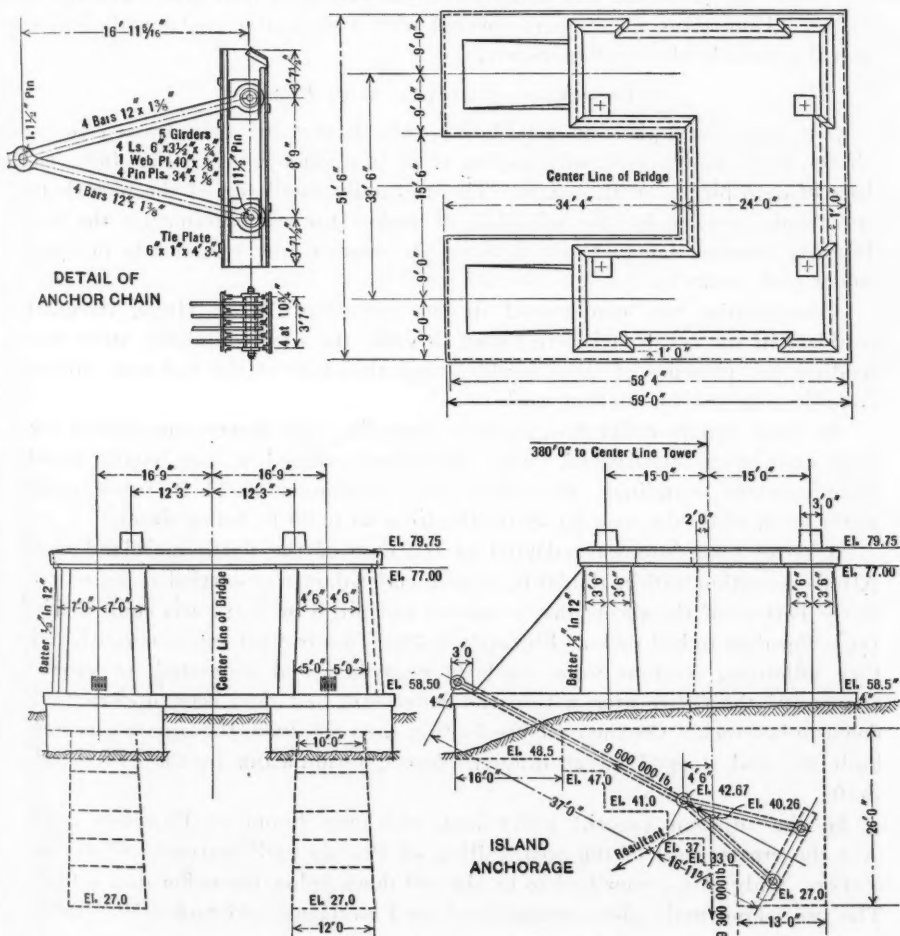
FINAL DESIGN FOR ANCHORAGES OF FLORIANOPOLIS BRIDGE.
